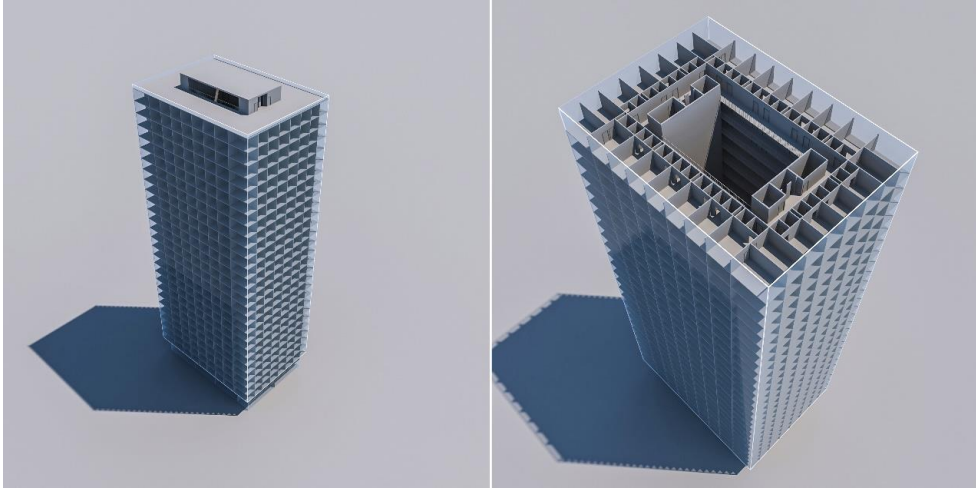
Perspective of the Repeated Rooms in Reference Case's Curtain Wall Facade (Left) and Repeated Thermal Study Unit – Typical Floor No. 35 (Right)
